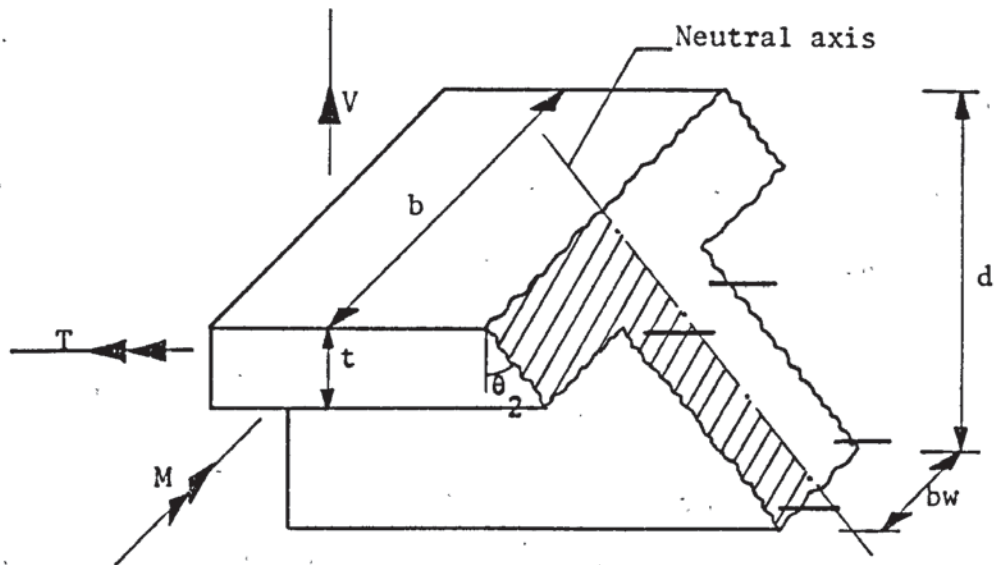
MODE TWO FAILURE IN PRESTRESSED CONCRETE T-MEMBERS UNDER COMBINED LOADING
